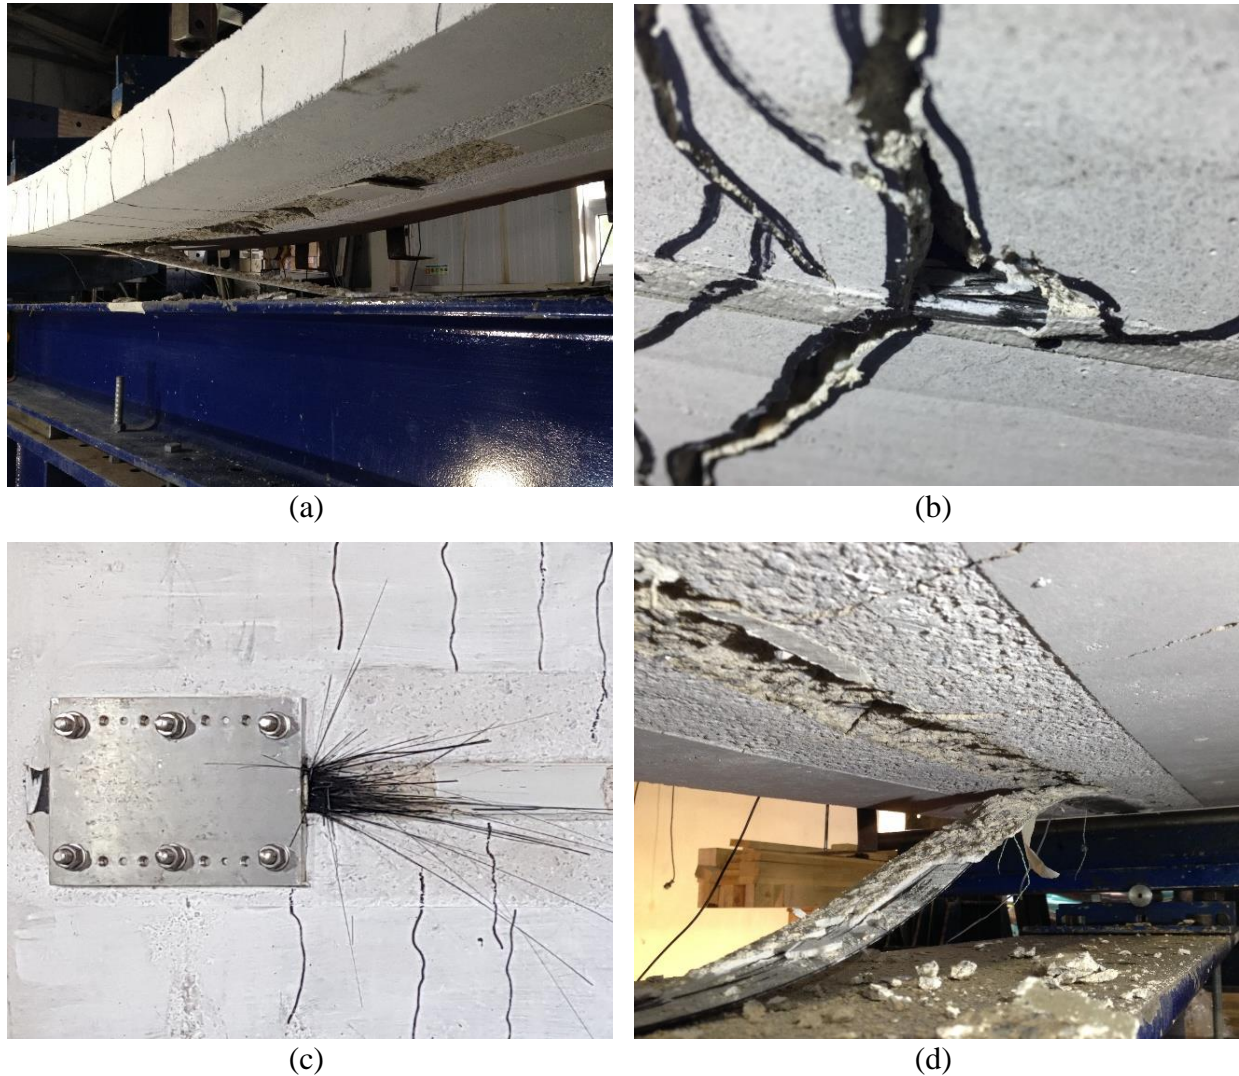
Failure modes observed in monotonic flexural tests up to failure on the CFRP strengthened slabs: (a) SL_EBR: CFRP strip detachment from concrete; (b) SL_NSM: CFRP strips failure; (c) SL_MA: CFRP strip failure; (d) SL_GA: CFRP strip detachment from concrete. Note: SL_REF slab failed by crushing of the top concrete under compression at mid-span.
